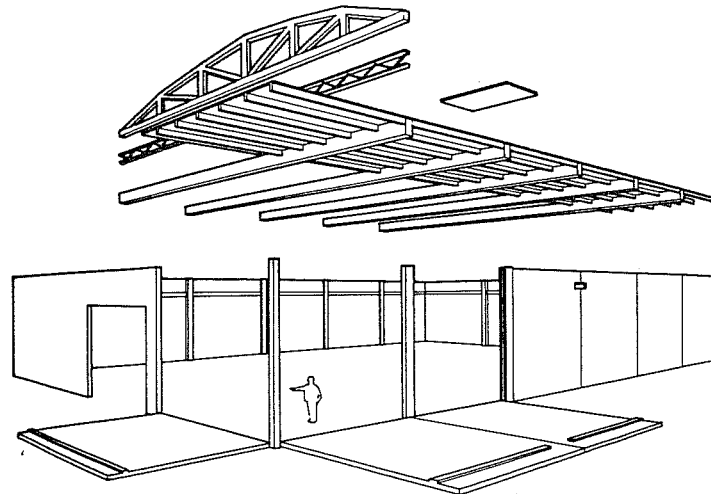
Typical Tilt-Up Construction used in the High-Tech Industry [4]
